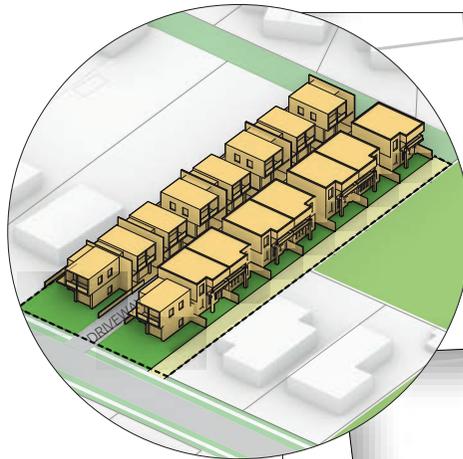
shows an alternative scenario where two adjoining large lots are consolidated and redeveloped to achieve 16 townhouses on 10m x 13m (approx) lots. A central driveway (5m wide approx) provides access to the dwellings. The rear right of way could also be utilised. Each has a side and rear private outdoor space.
